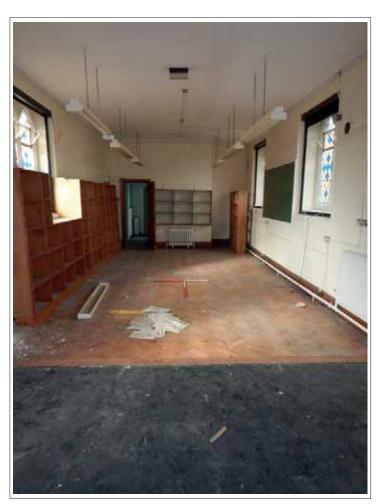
Chapel, Room 0.6, looking north. 1m scales.
